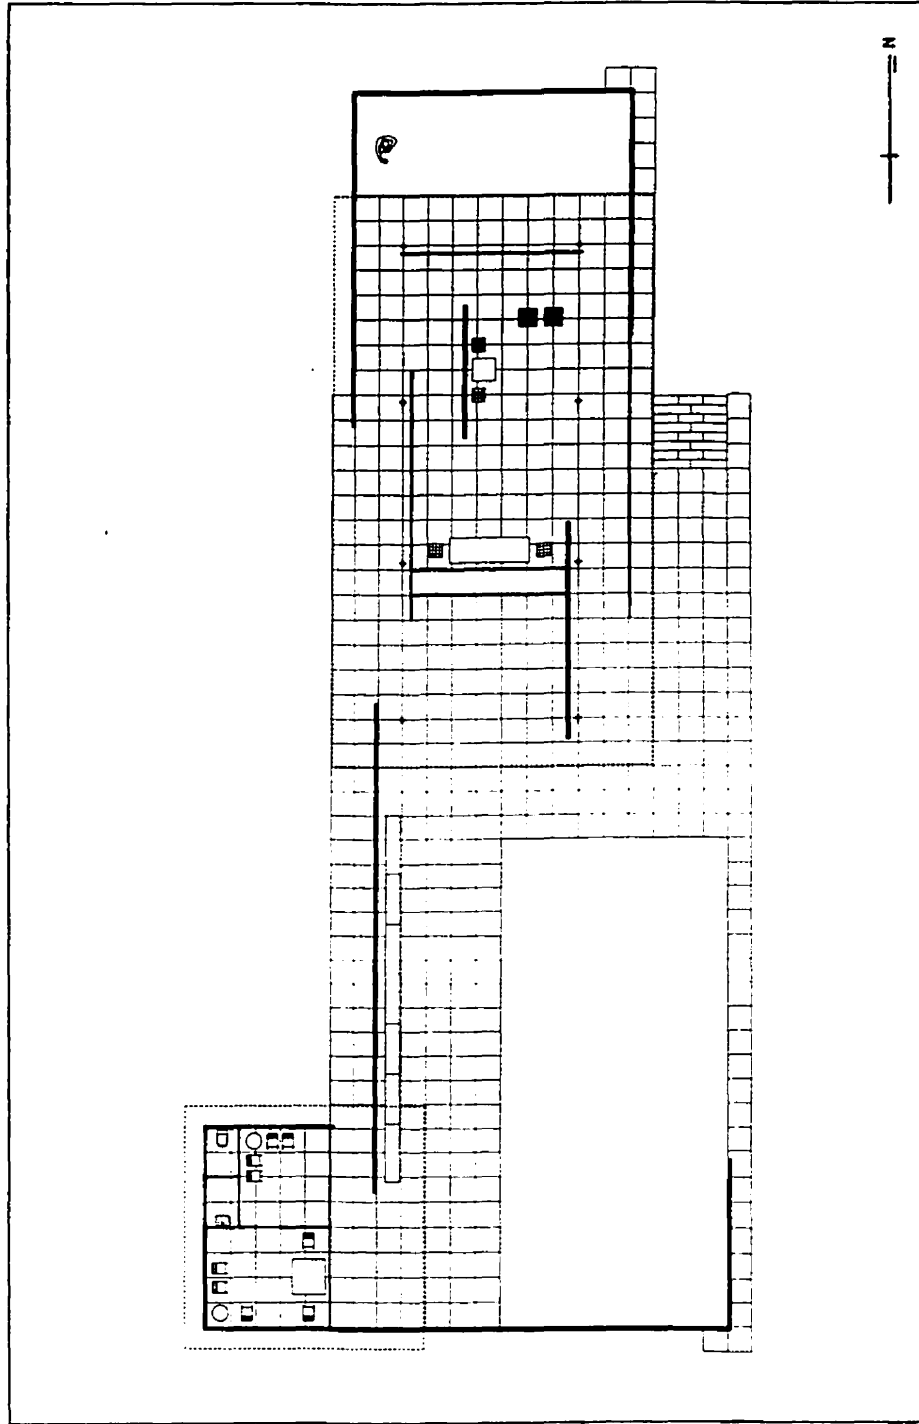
Plan, Barcelona Pavilion, 1928-29.
